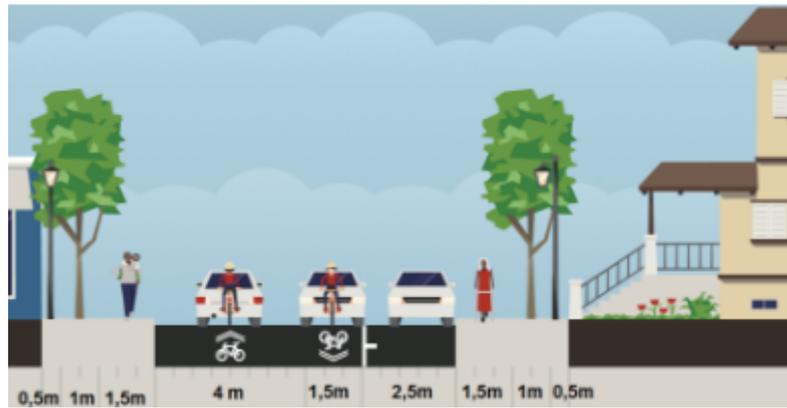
The cross section of Bosman road, between Banghoek road and Merriman Avenue. Source: Streetmix (2016) edited by Elina Hederberg and Helena Homle
